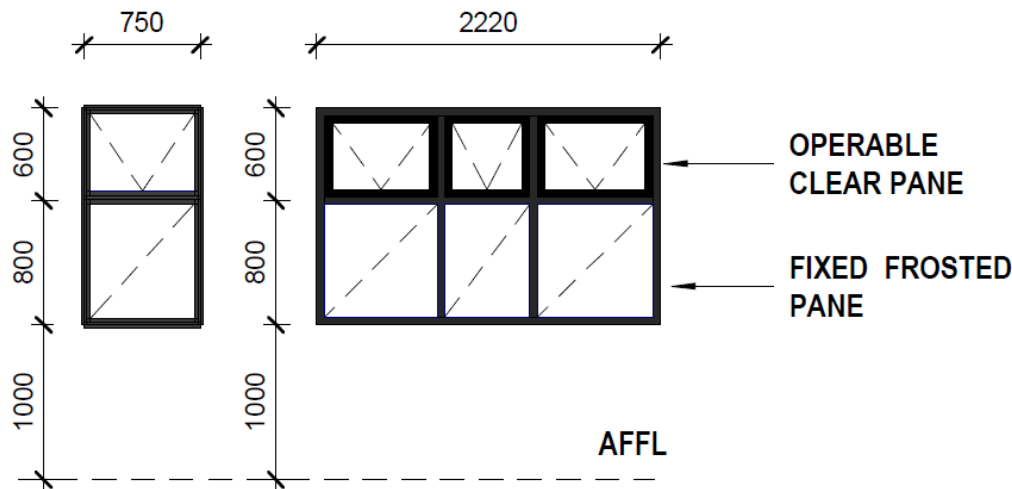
Proposed windows facing internal courtyards within the subject site, with fixed, obscure-glazed windows to 1.8m and operable windows above
